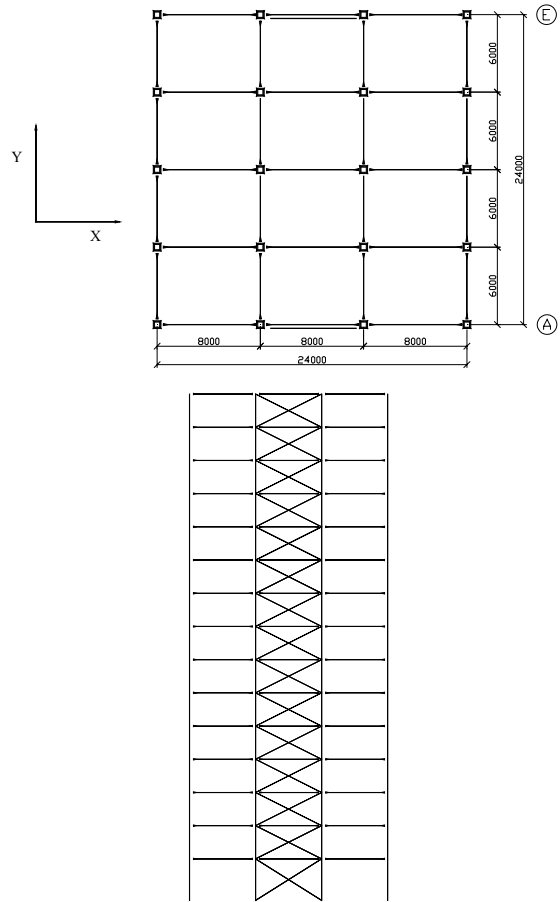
Structural layout: (a) Plan and (b) Elevation A-E
